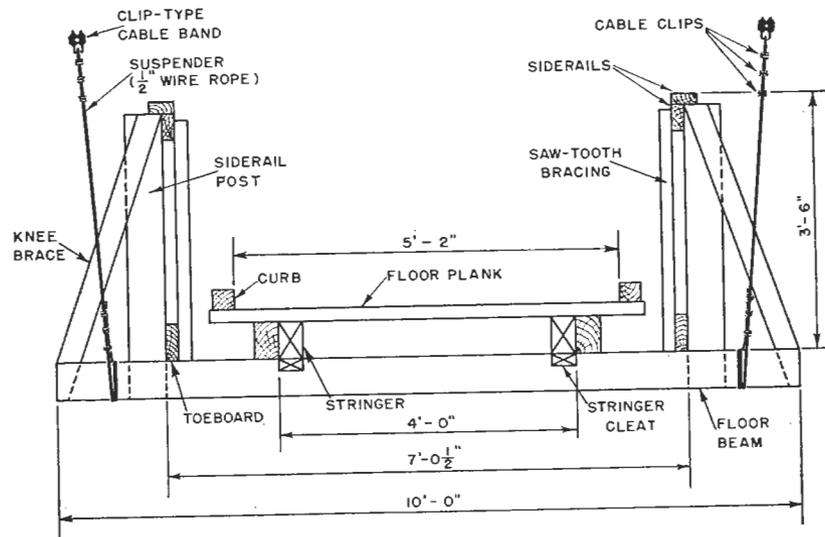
Floor and siderail system of light-equipment suspension bridge.
